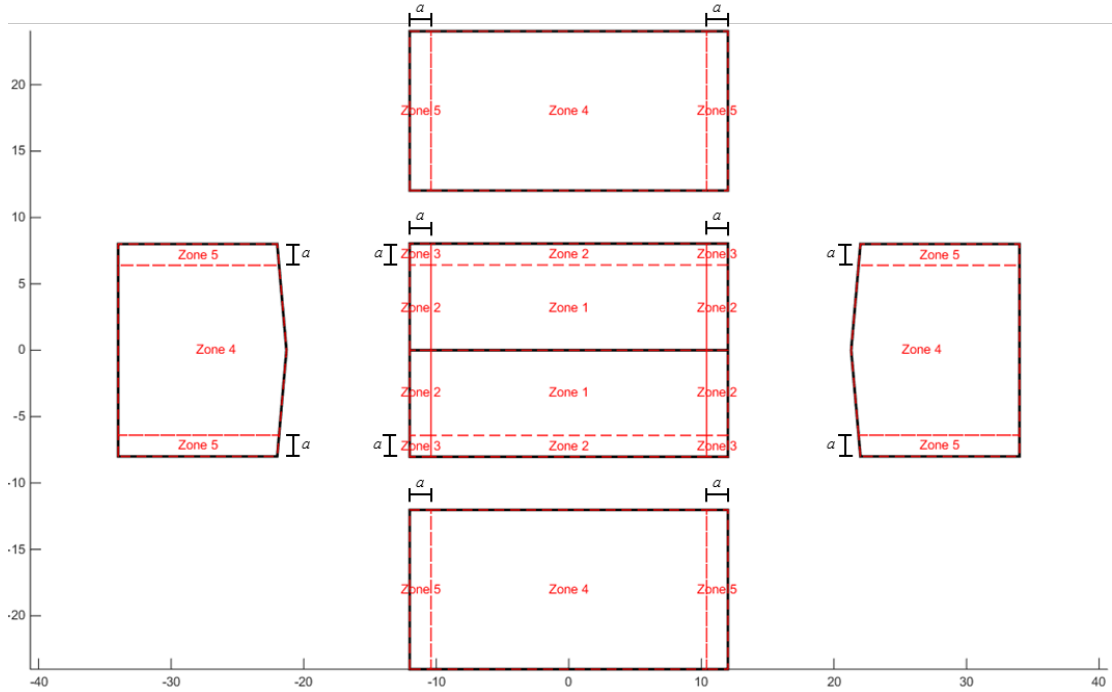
Zone layout for a gable building with roof pitch $\leq 7^\circ$ (Figure 30.4-2A, ASCE 7-10)
